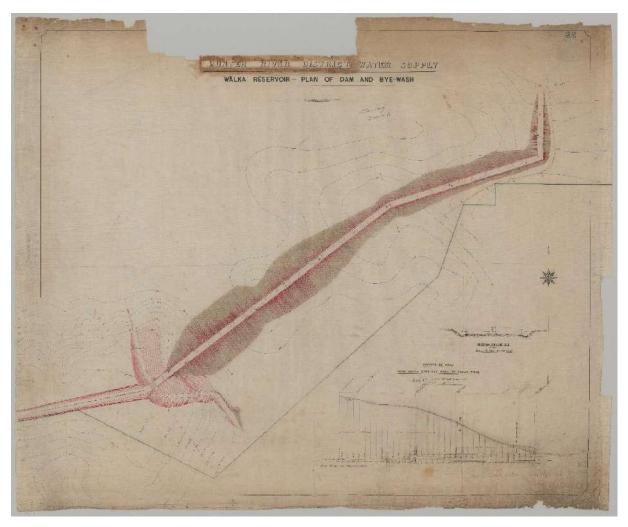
Original design plan for the Embankment from 1882 showing scale and details of construction AF00065745.
